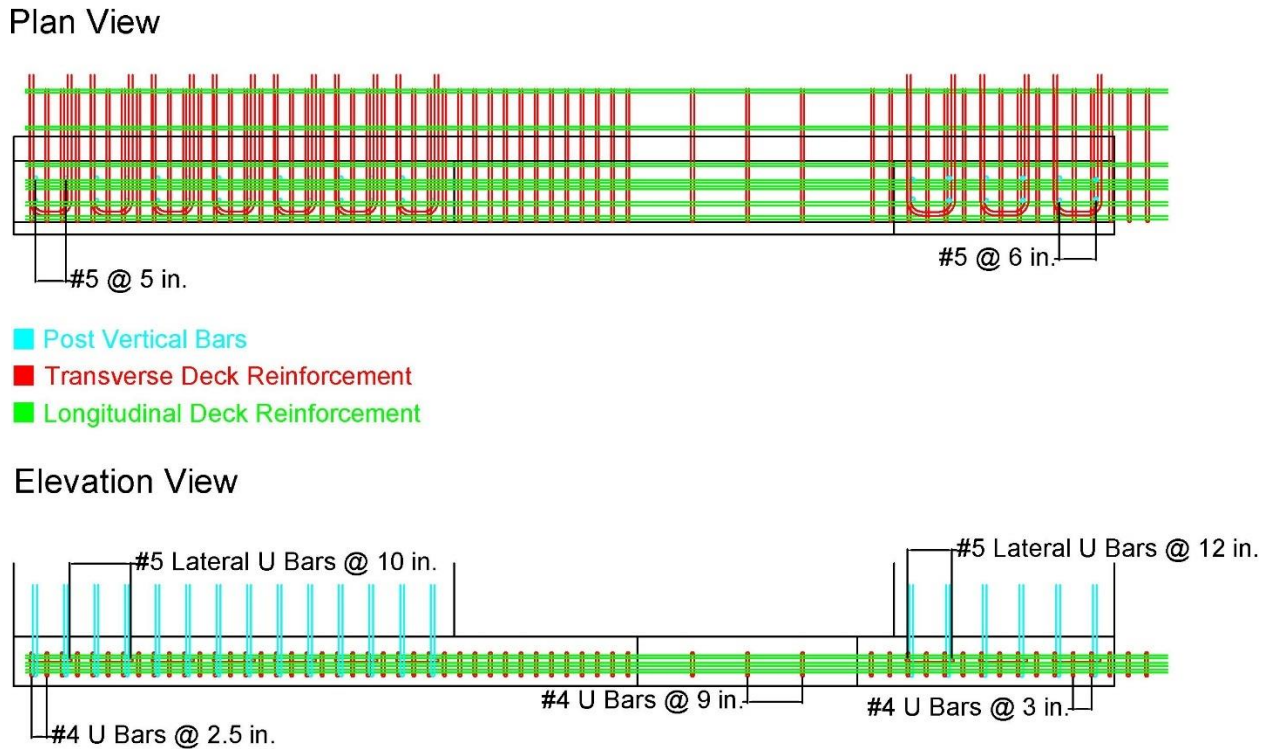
Option 1, End Post to Interior Post Transition Deck Reinforcement, Plan and Elevation Views
